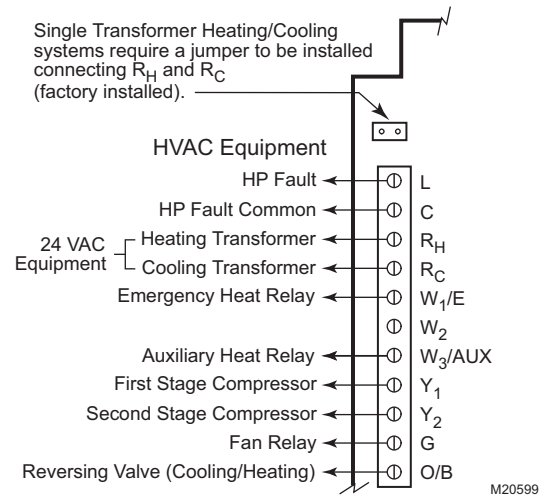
Wiring two-stage heat pump with separate Auxiliary Heat.
